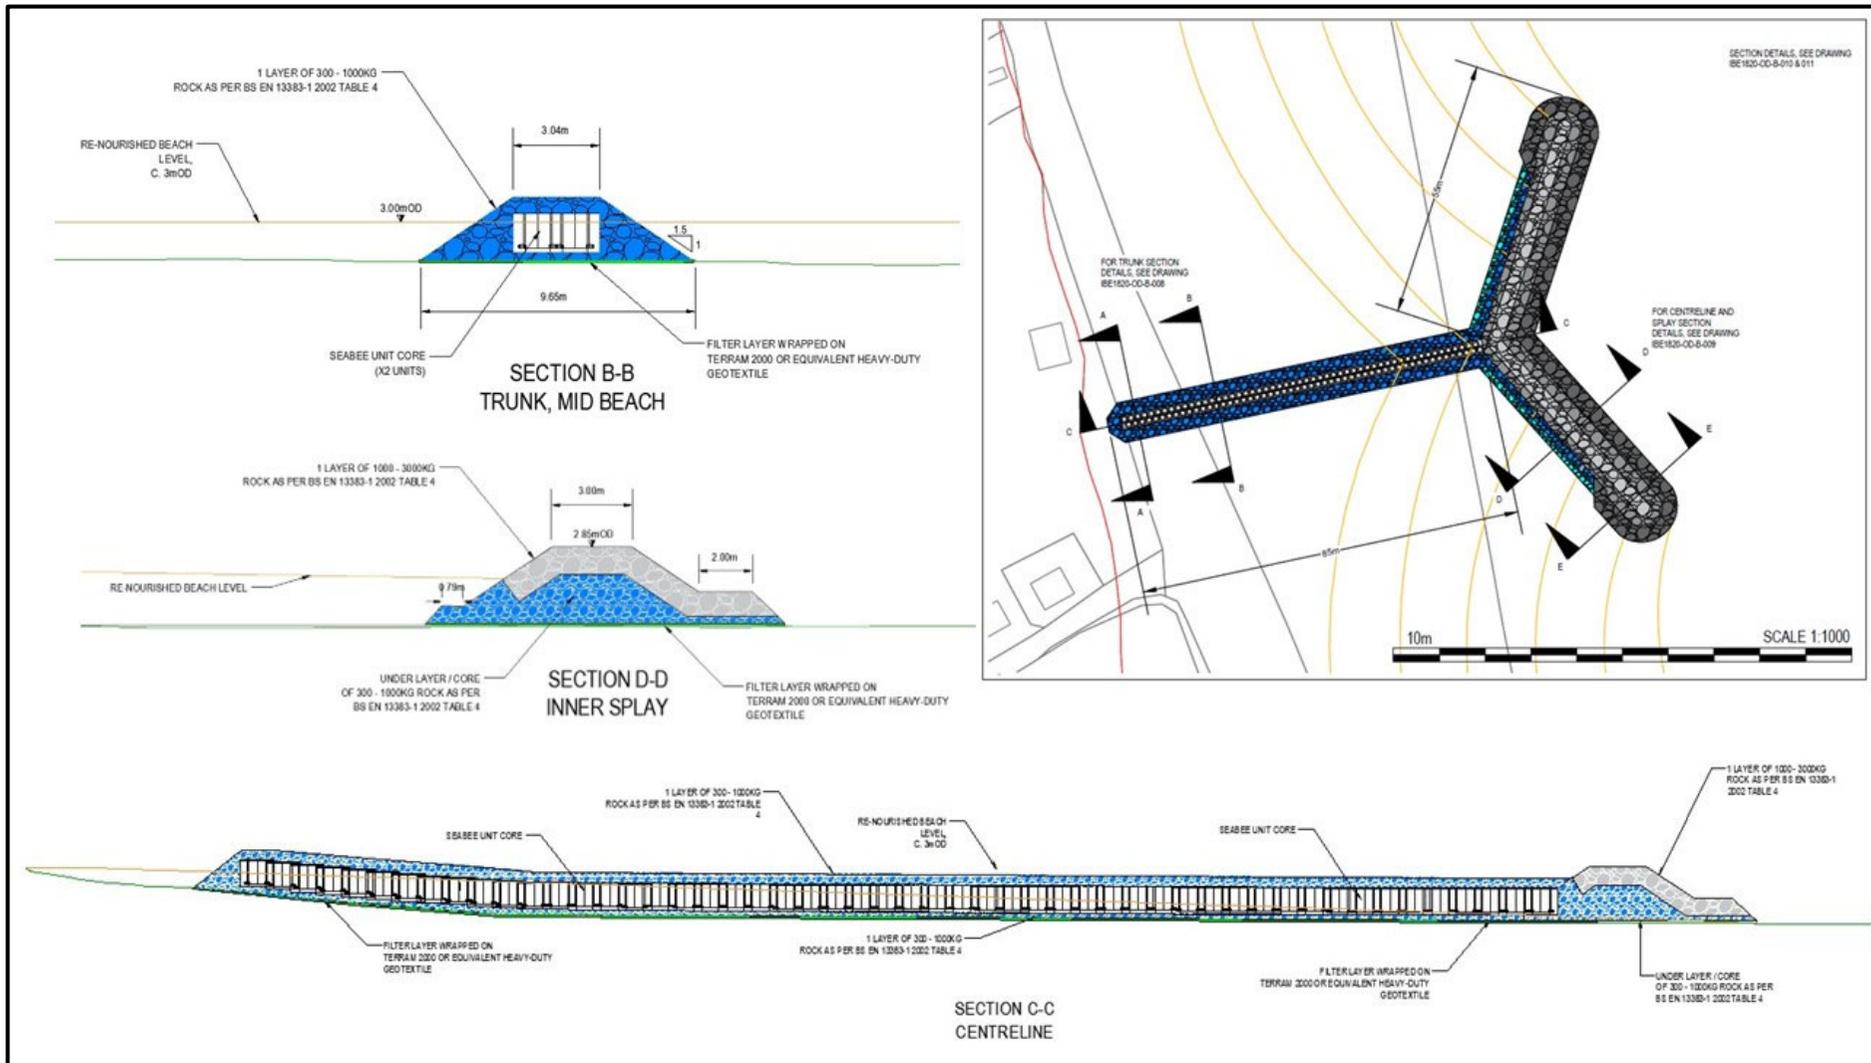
Cross section of a typical fishtail groyne structure and beach renourishment level
